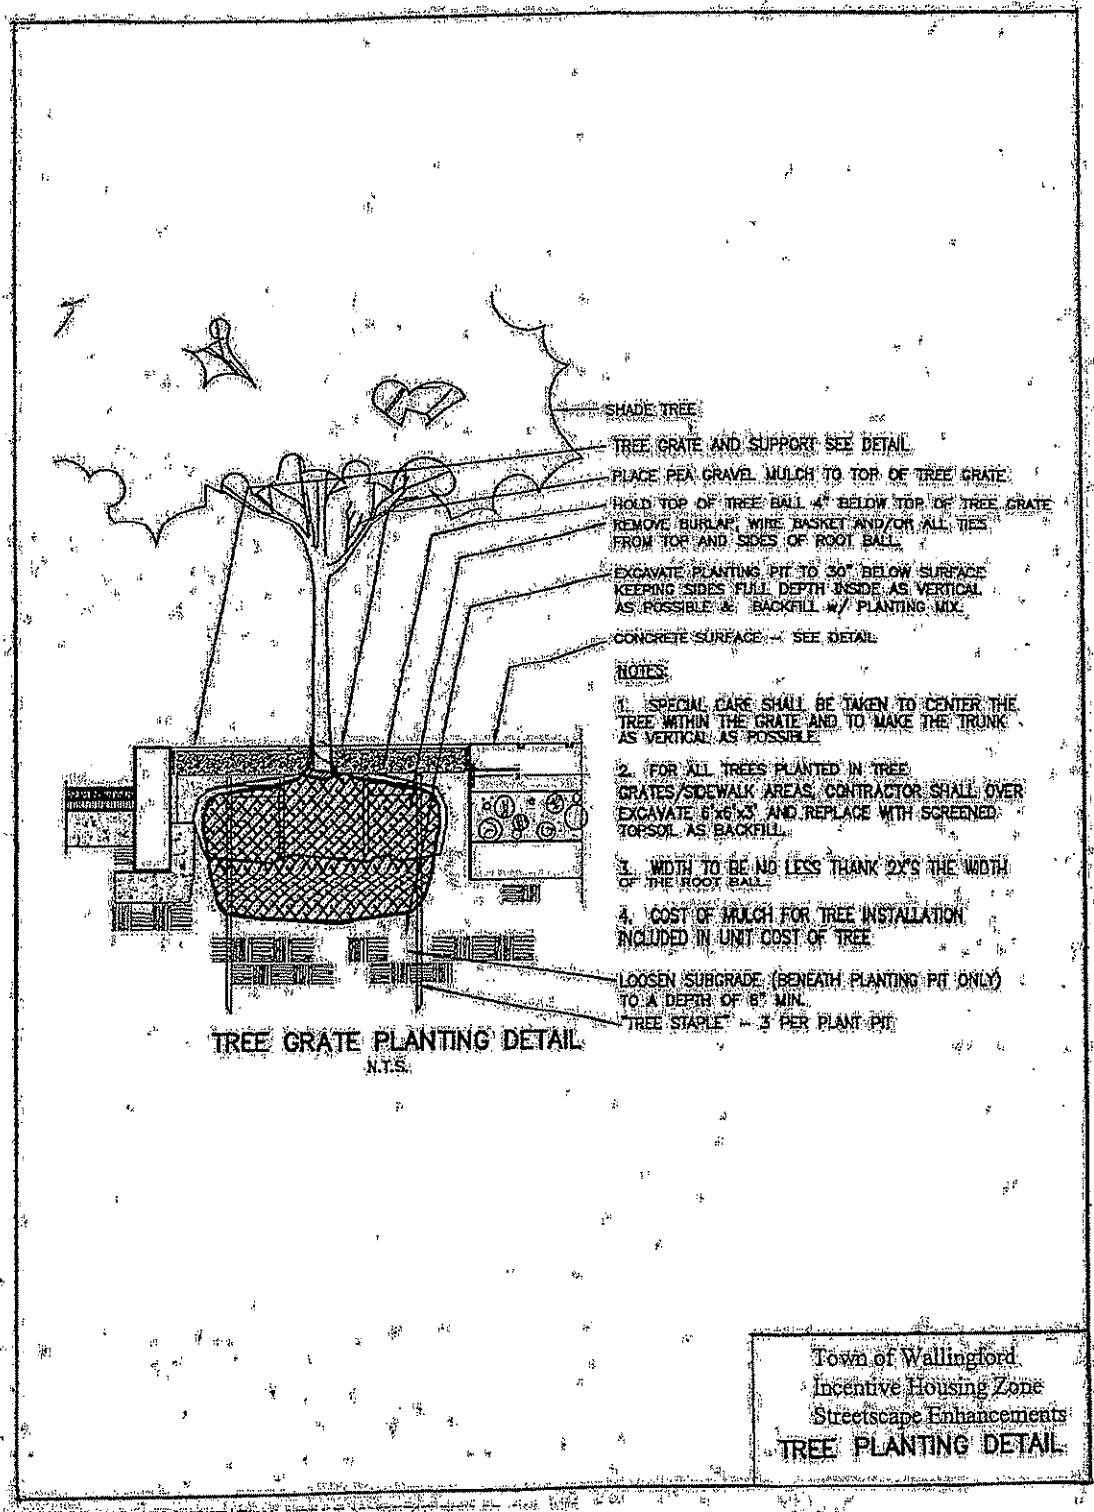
Typical Street Tree Planting Detail, Incentive Housing Zone
